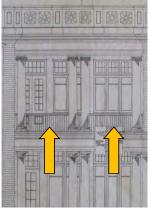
Original elevation drawing showing the open balconies with timber balustrading.
